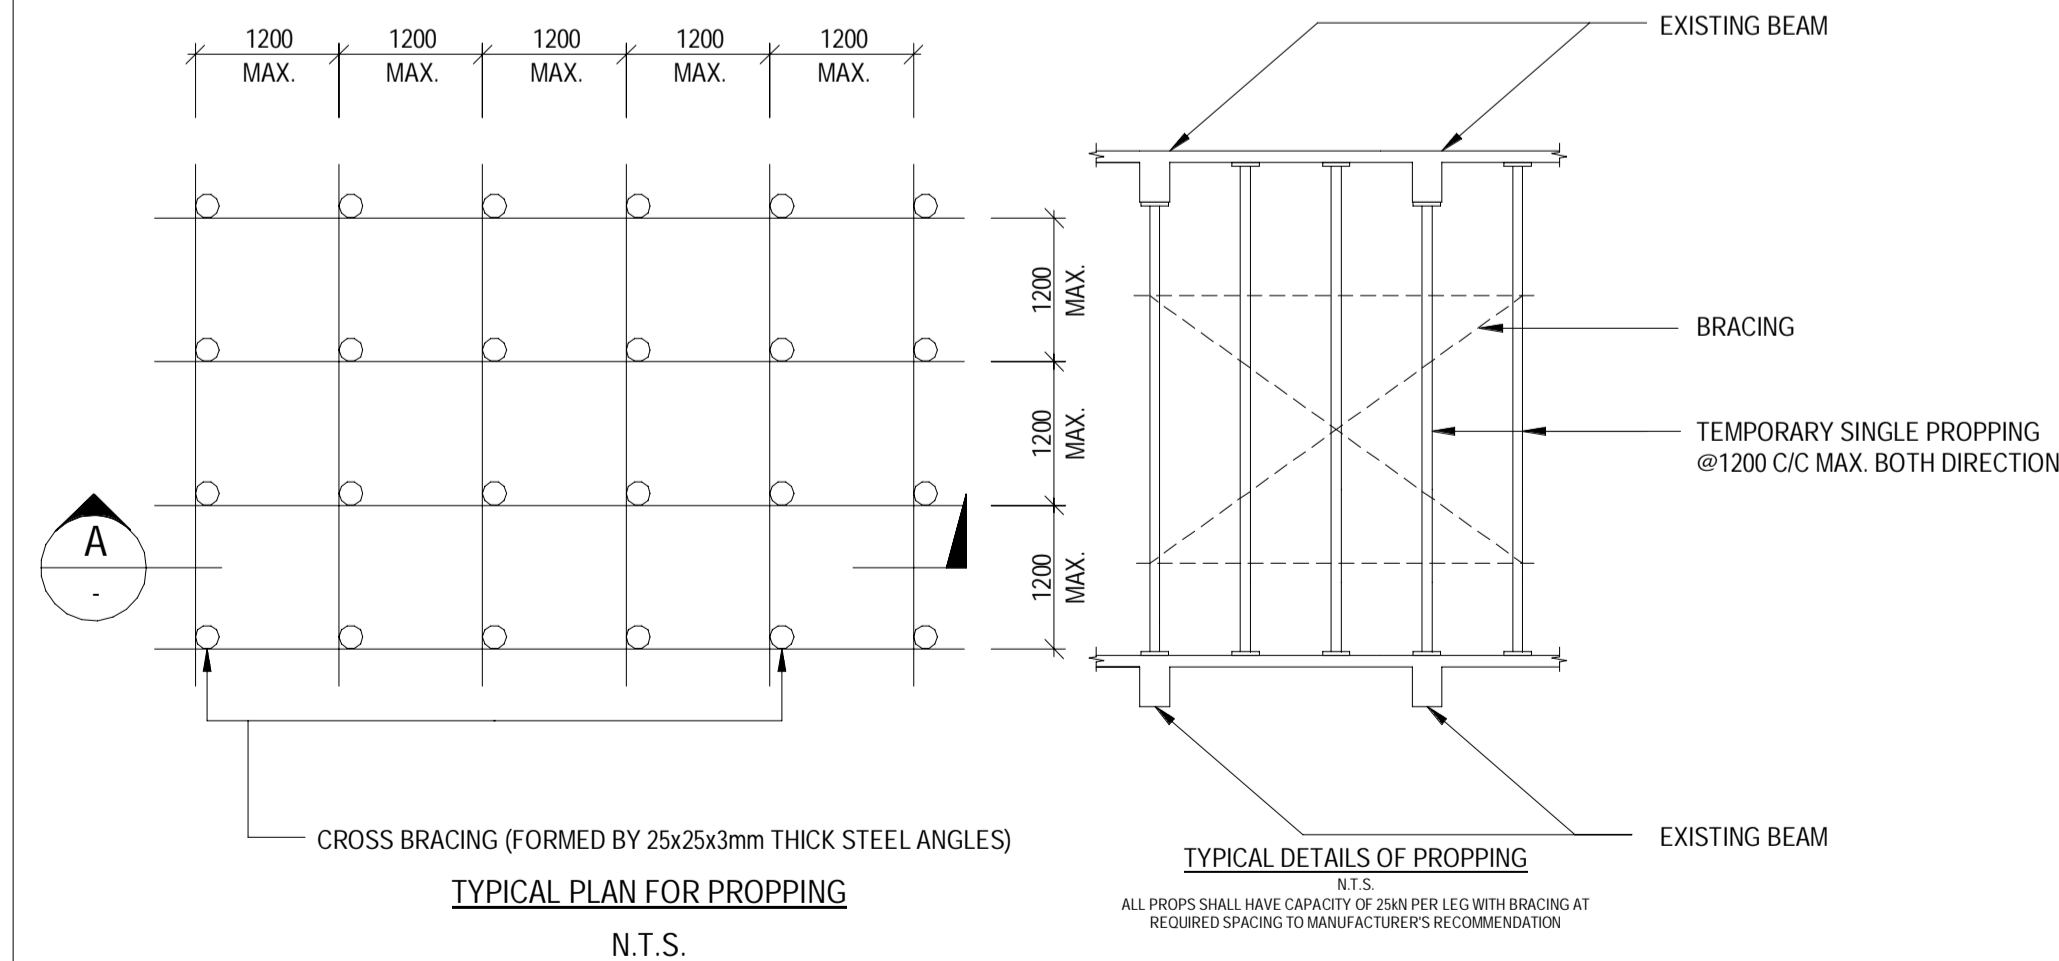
DETAILS FOR SECURING EXTERNAL BEAMS BEFORE DISMANTLING
